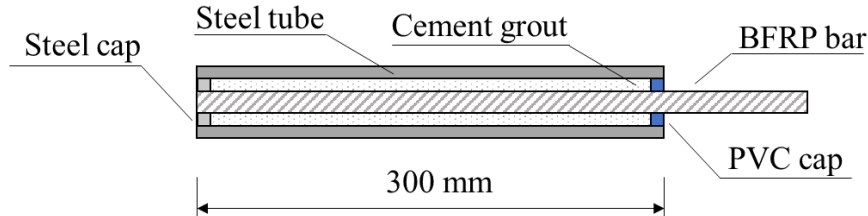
Detail of anchorage system for BFRP bars tensile test protection.
